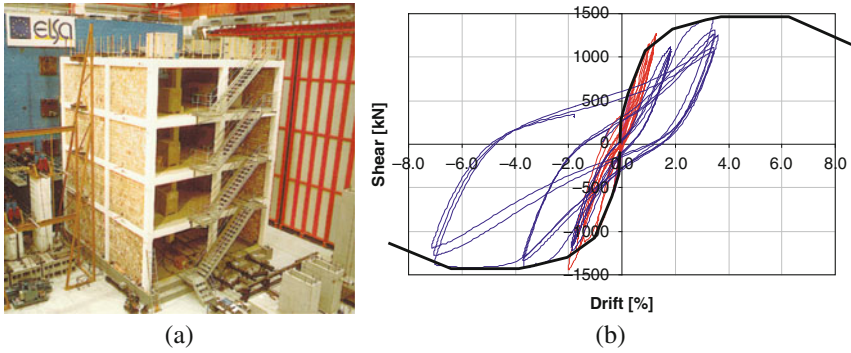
R/C structure tested at ELSA: (a) Infilled frame configuration, (b) Bare frame 1st storey shear-drift diagrams
